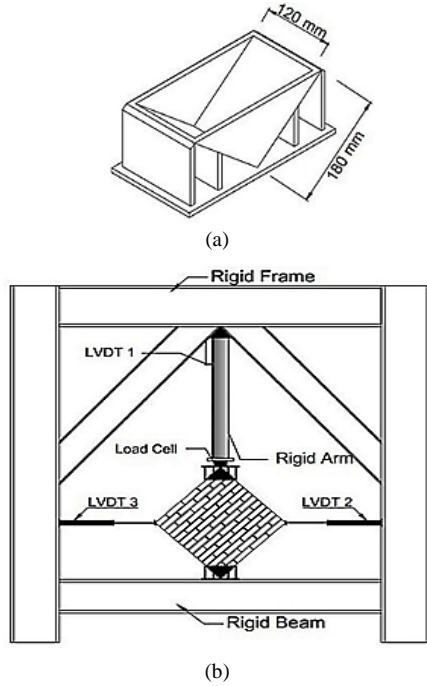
Test layout of diagonal compressive loading on the wall: a) loading shoe b) Location of load and displacement measuring tools
